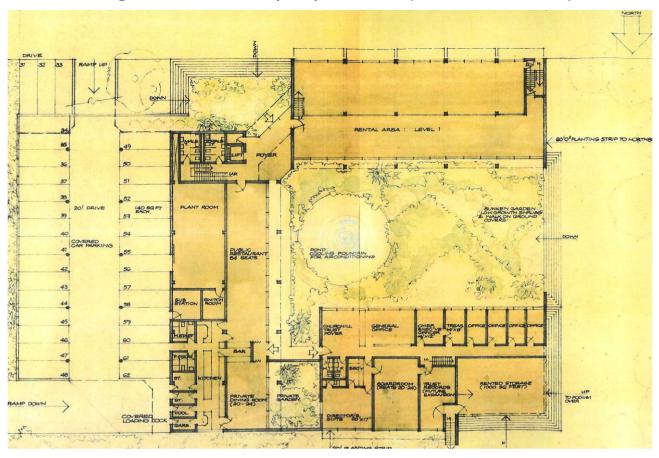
Boyd's original drawings of Churchill House – first floor plan (courtesy of Ann Cleary)
